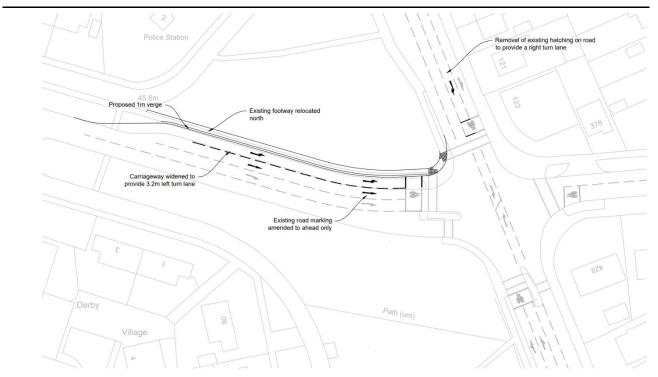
Merrill Way/A514 Junction Improvement Proposed as Part of New A50(T) Junction and Link Road Scheme.
